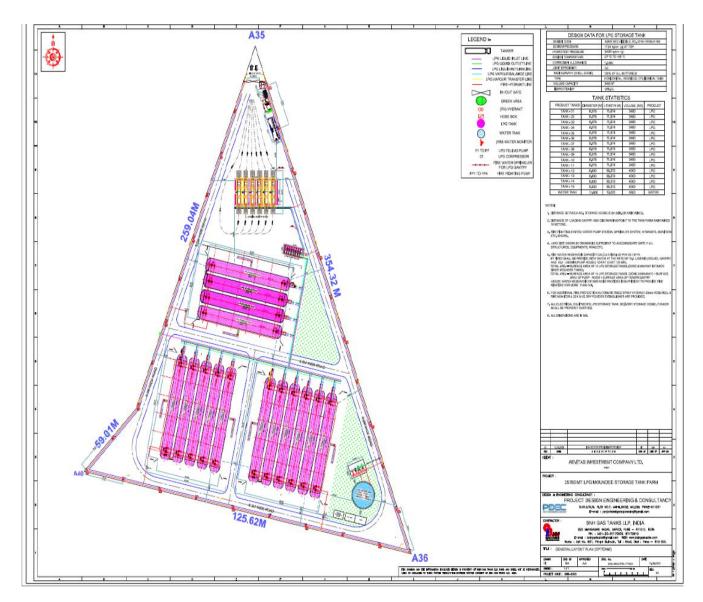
Preliminary Layout for 27000 MT LPG Mounded Storage Tank Farm
